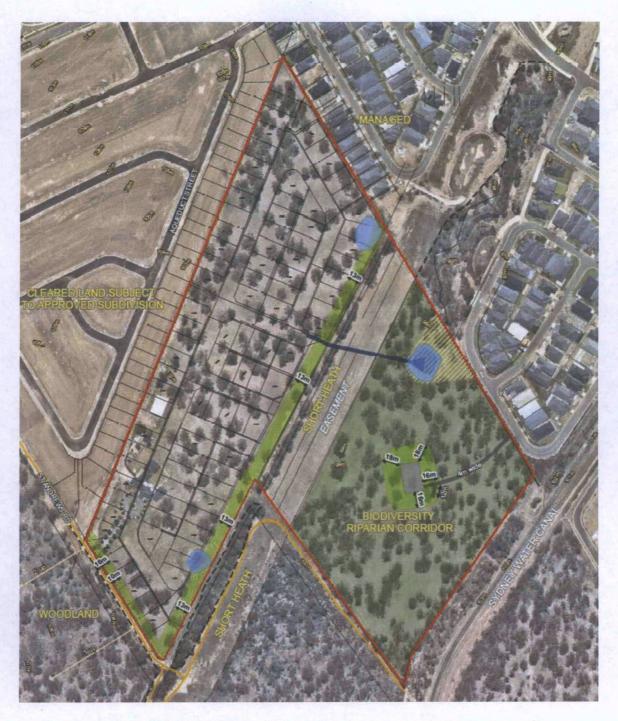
Concept subdivision, asset protection zones and stormwater works
